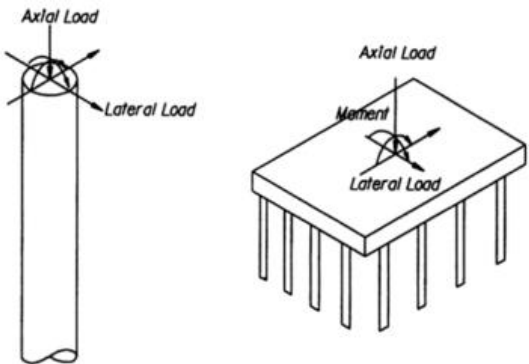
Acting loads on top of a pile or a pile group: a) Single pile and b) Pile group [30].
